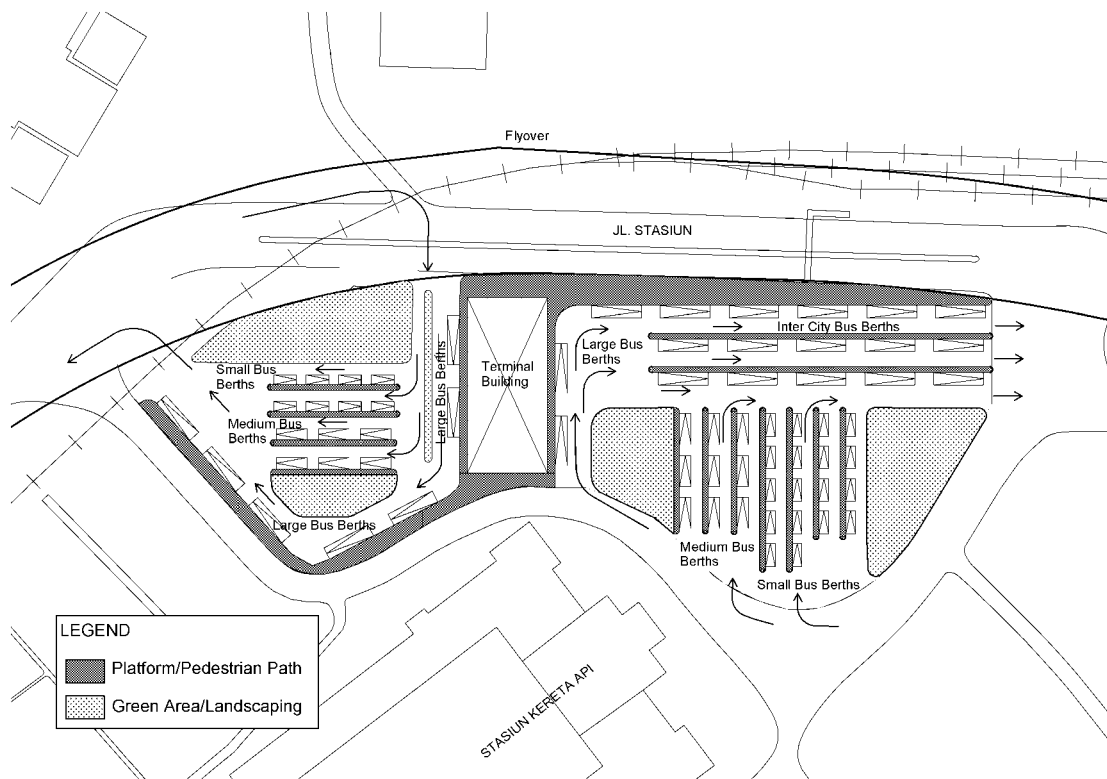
B-8 Proposed Layout Plan for the Alternative-1
